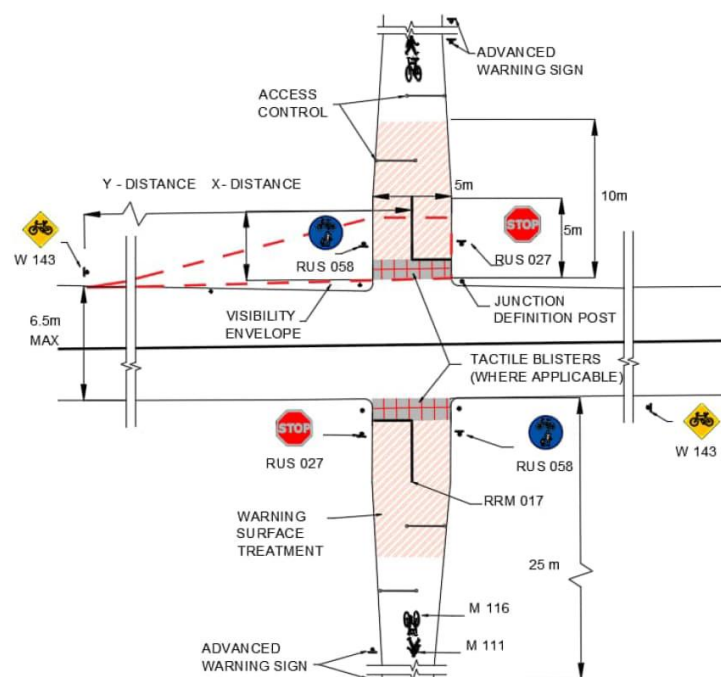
Local & Regional Road Carriageway Crossing Detail
